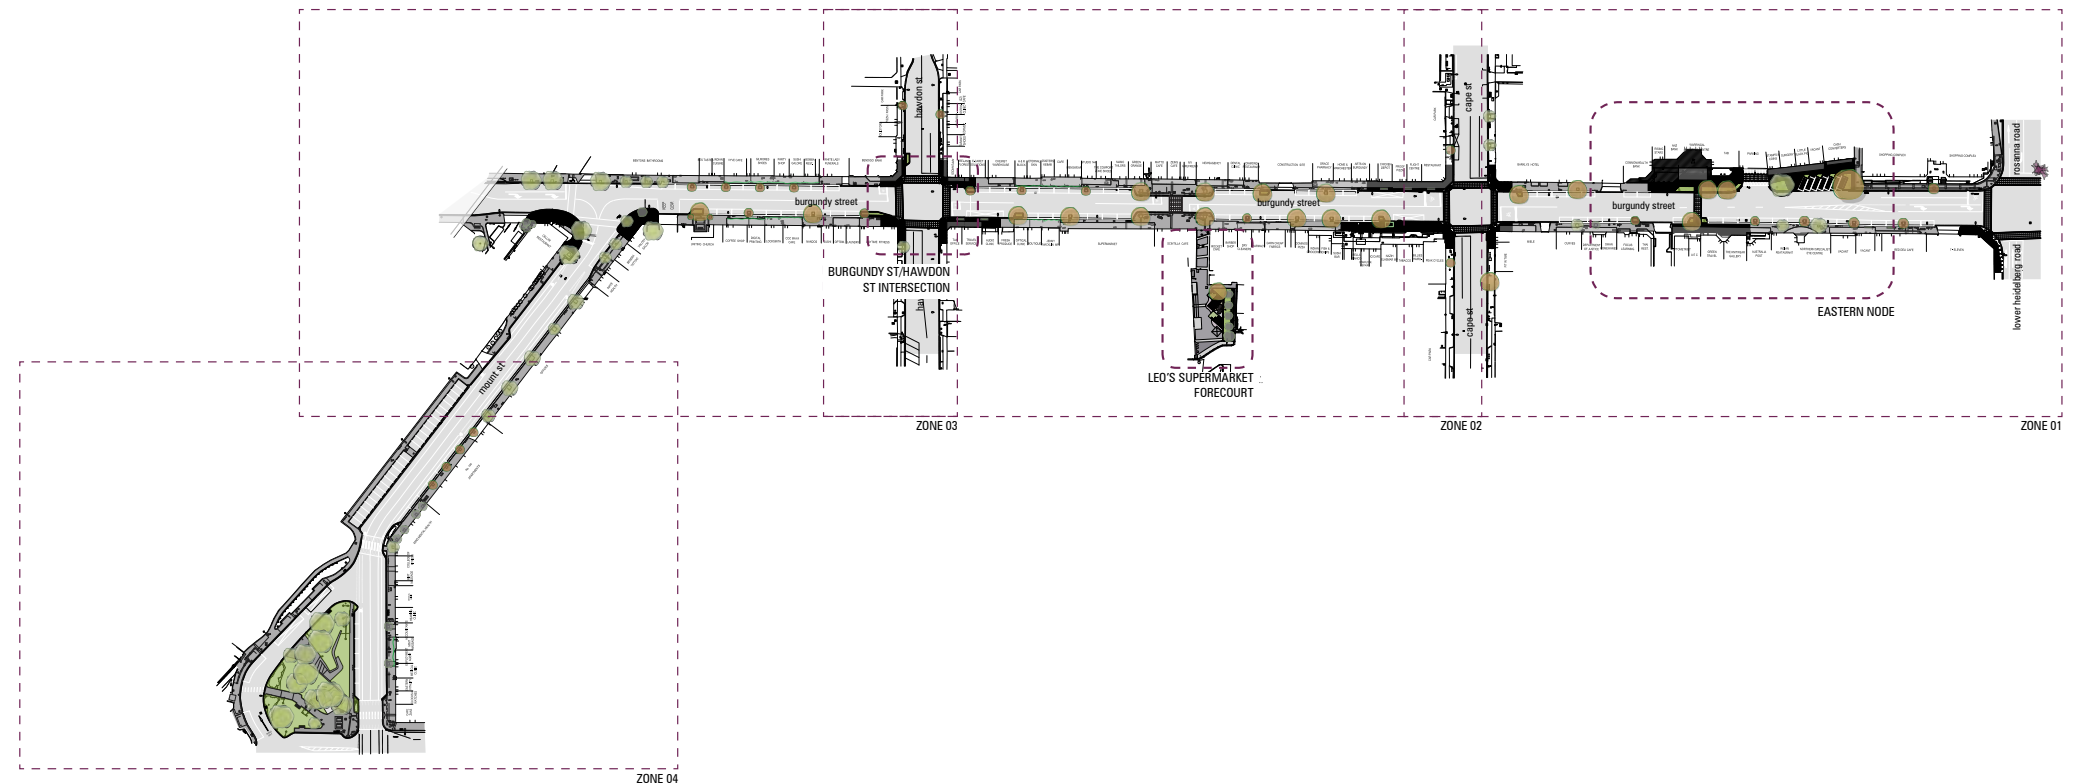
Master Plan (source: Heidelberg Central Master Plan, 2016)
